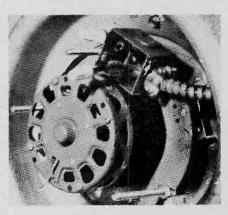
Here is a close-up of the fan motor and electrical connections. BX cable comes from house wiring and connects to an electrical box mounted on the motor. Wire nuts cover the splices.
